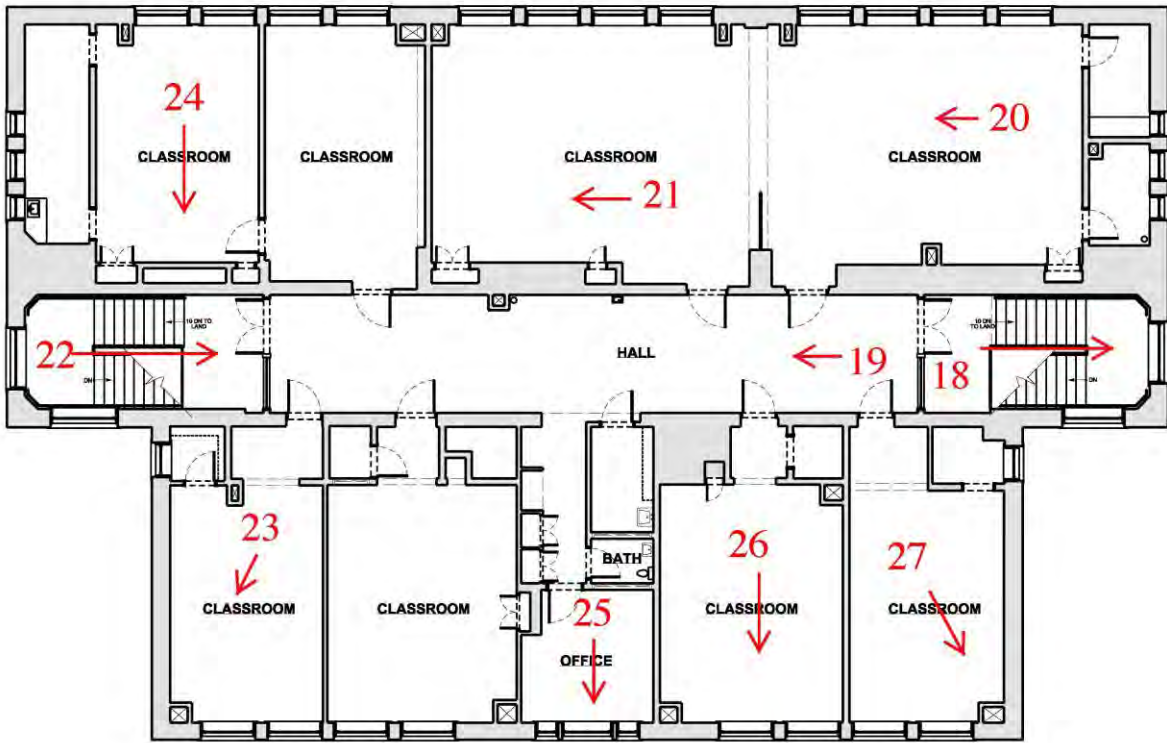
First Floor Plan, showing exterior and first floor interior photo locations.
